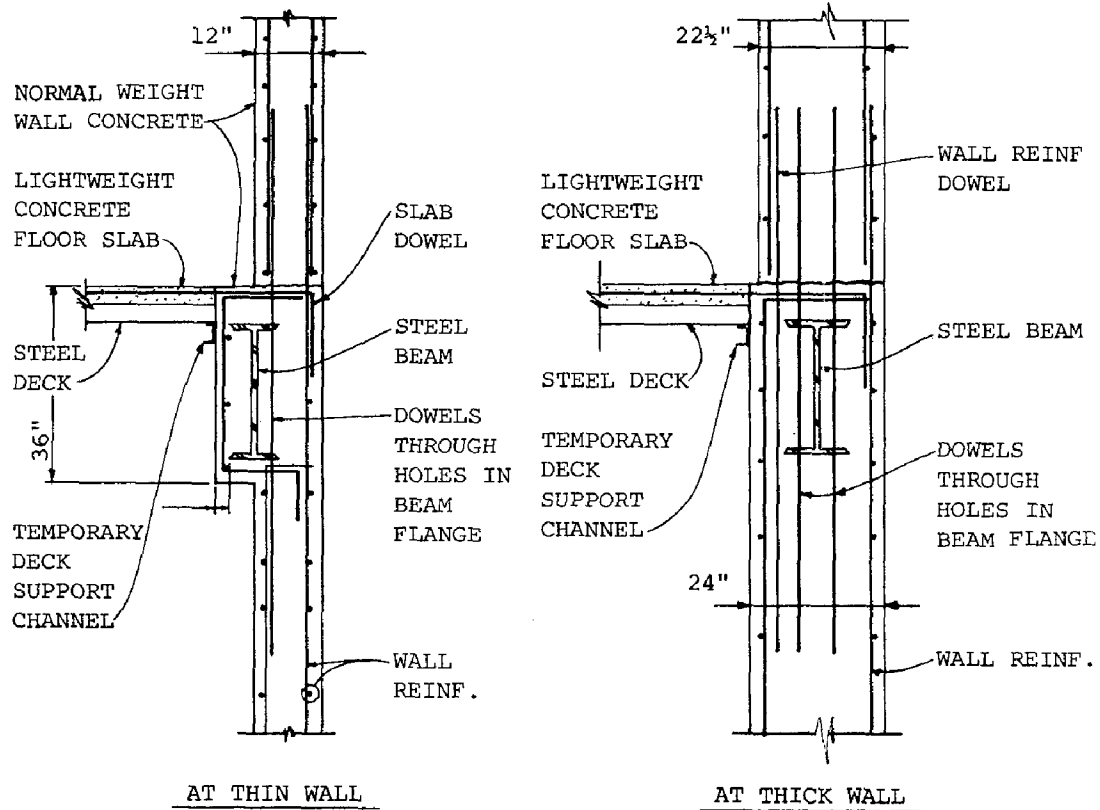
TYPICAL FLOOR/SHEAR WALL DETAIL
